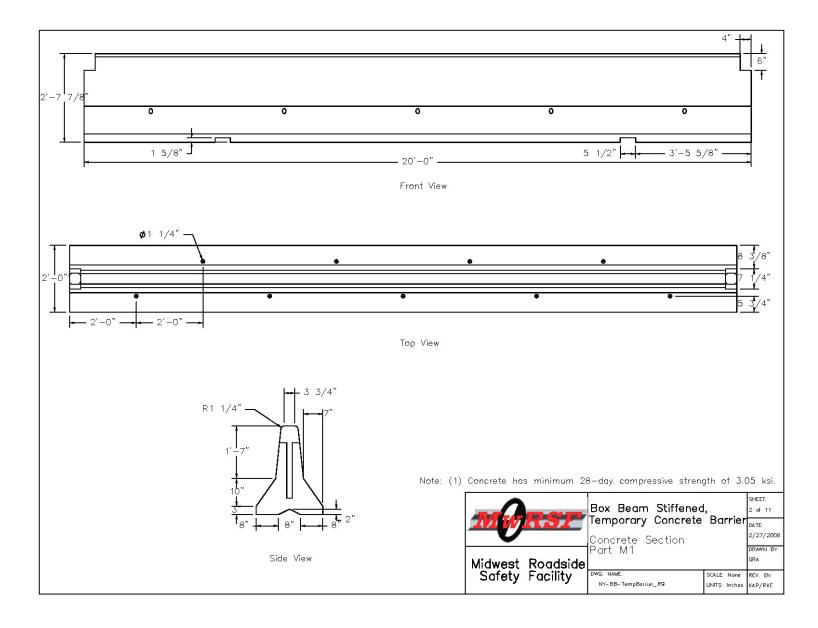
Temporary Concrete Barrier Details (English), Test NYTCB-1
